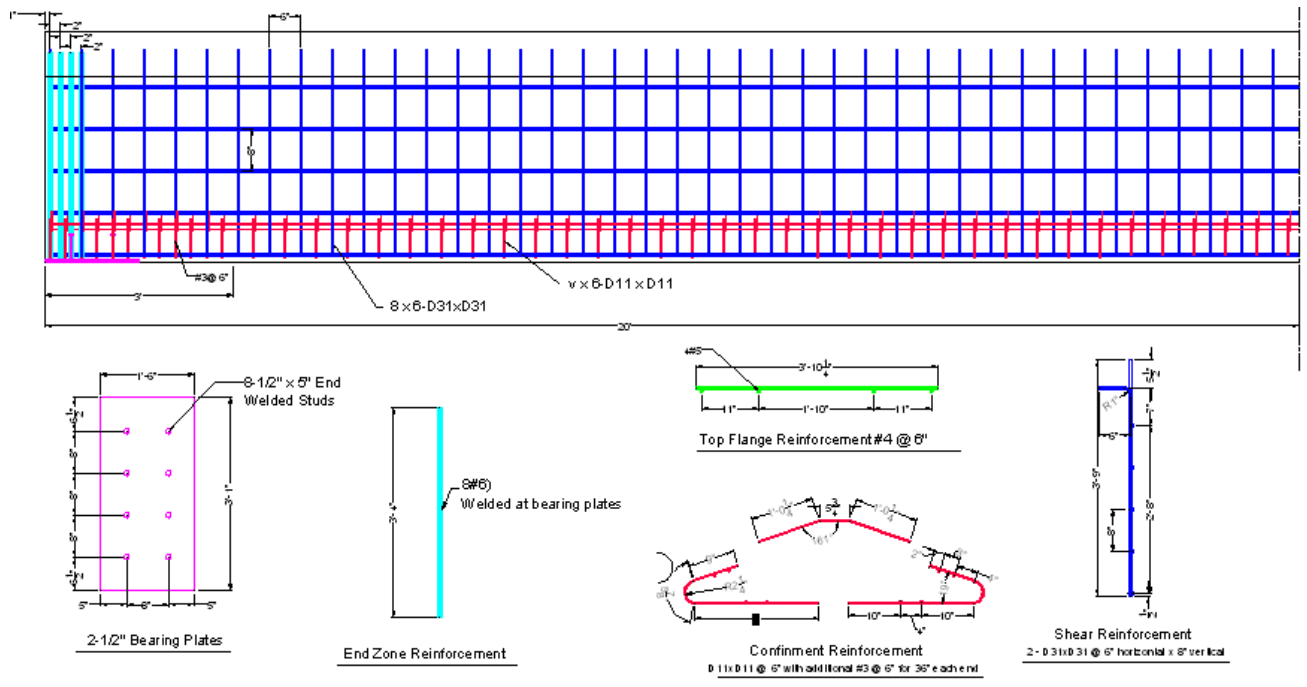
Elevation and Reinforcement Detail of NU900 Girder
